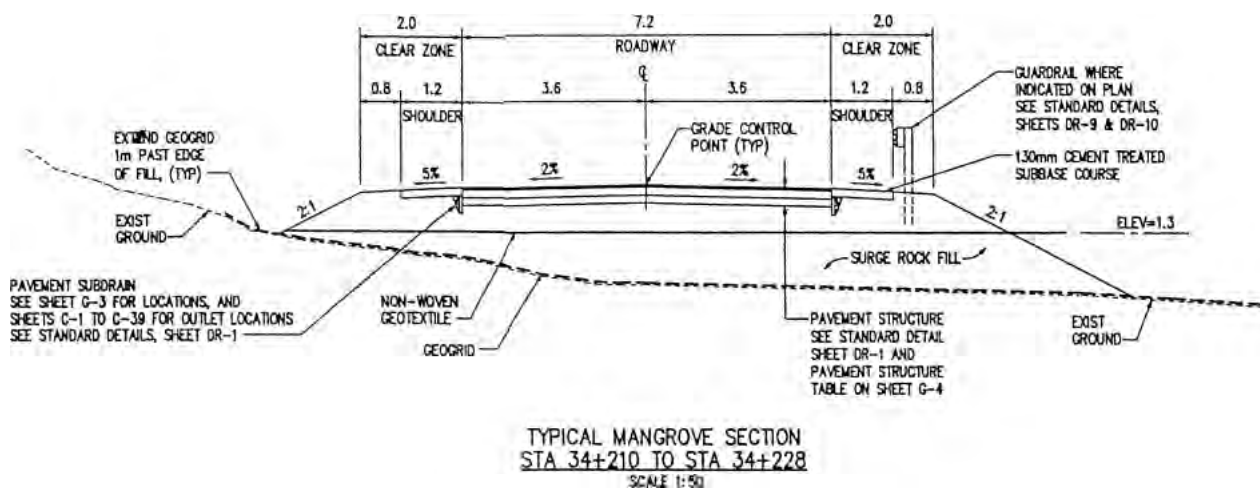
Typical Cross Section of Compact Road (Sheet No. G-6)
